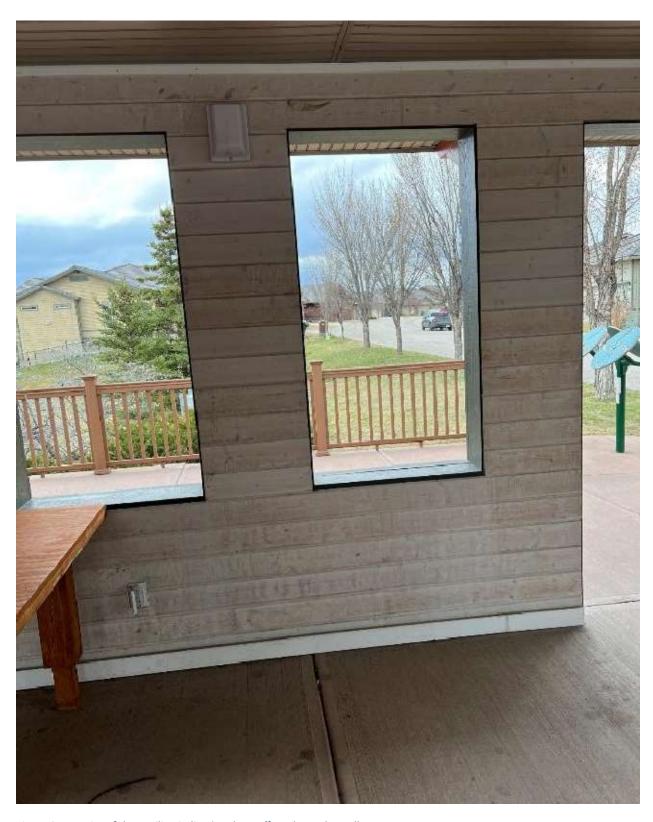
Interior of the pavilion indicating the scuff marks on the wall.
